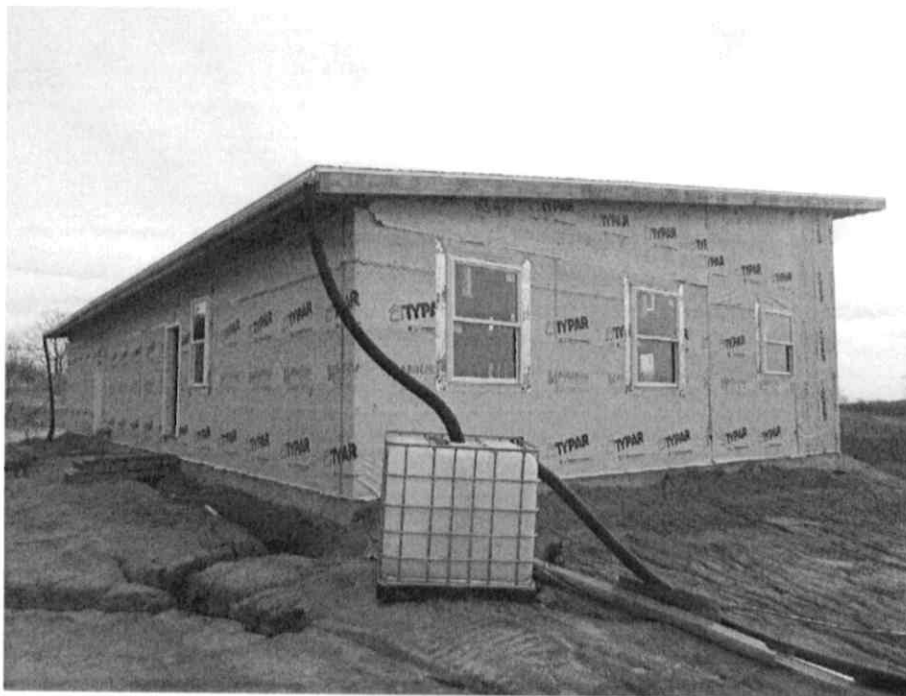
View of the west and north elevations of the residence showing the northwest corner of the residence in the foreground.
